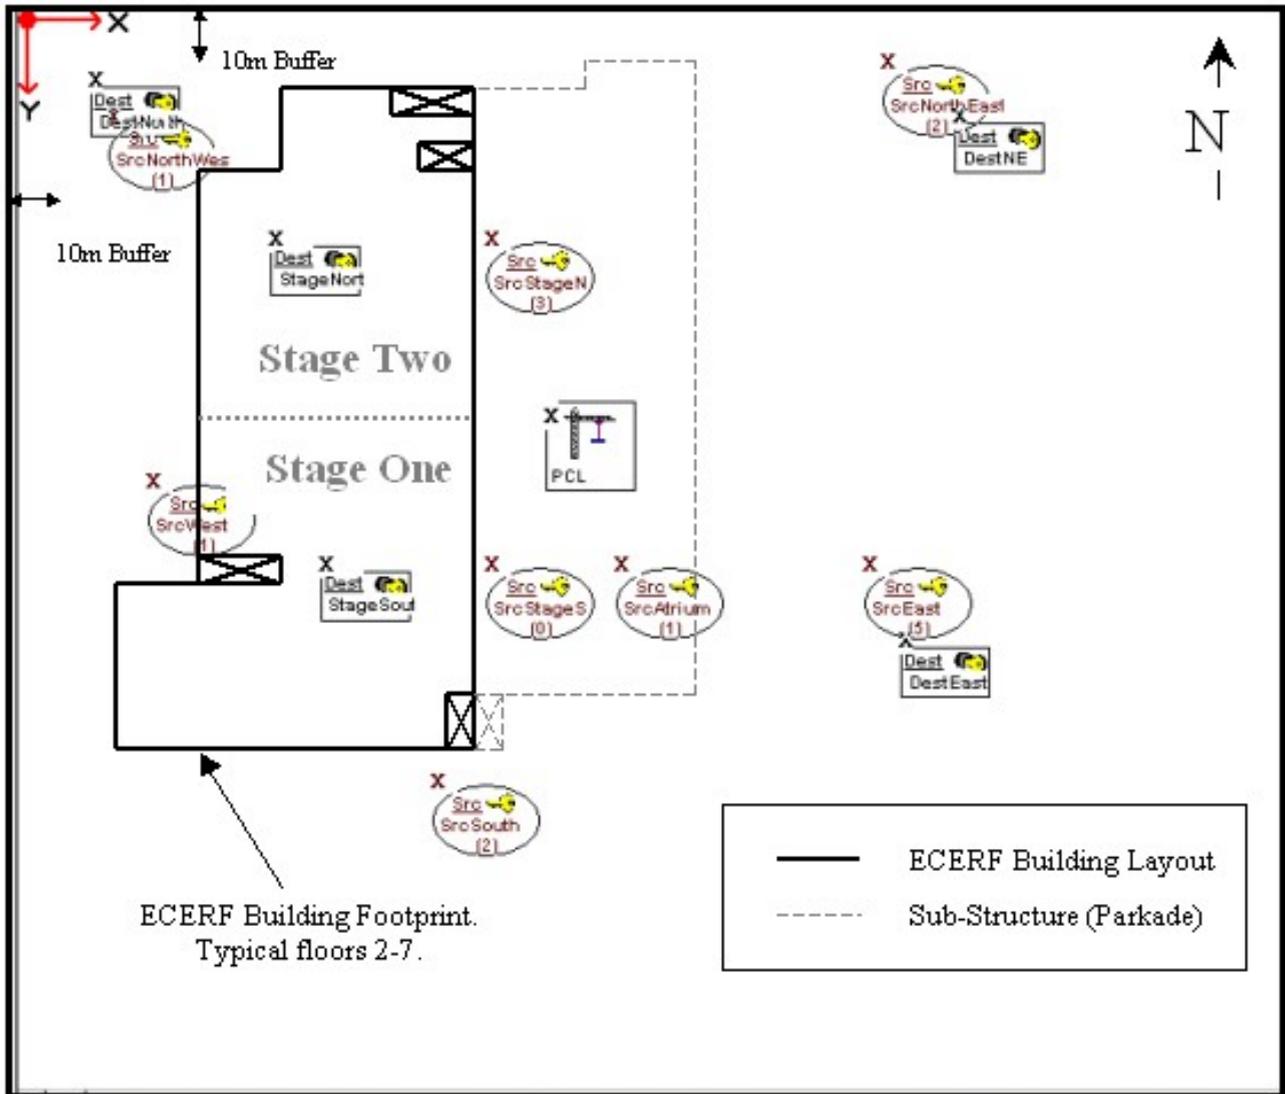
ECERF Building Floor Footprint and Model Elements (Typical Floors 2-7)
